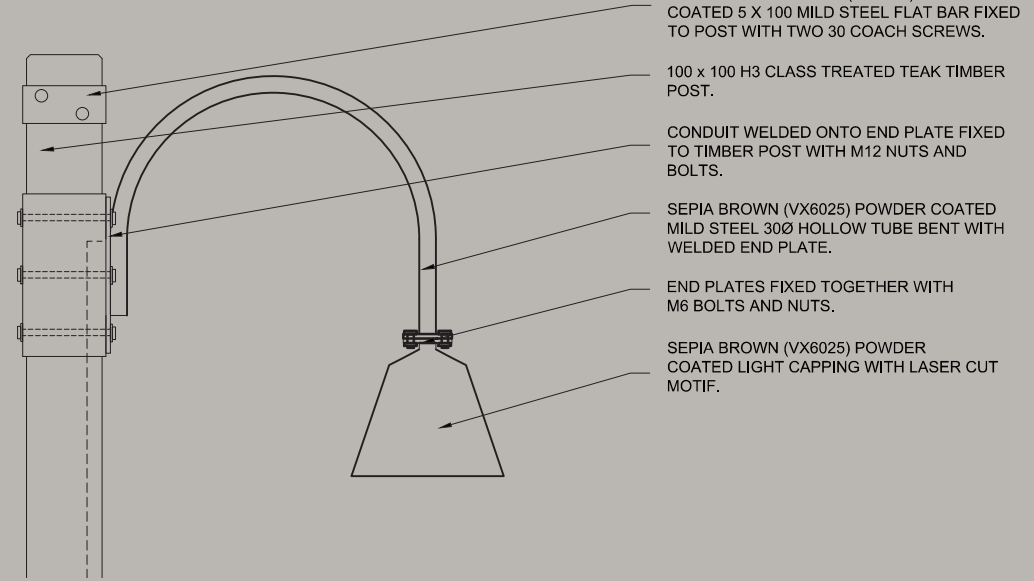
Detail Section (1:10) of Lamp Post Light Fixing Detail (Author, 2014).
